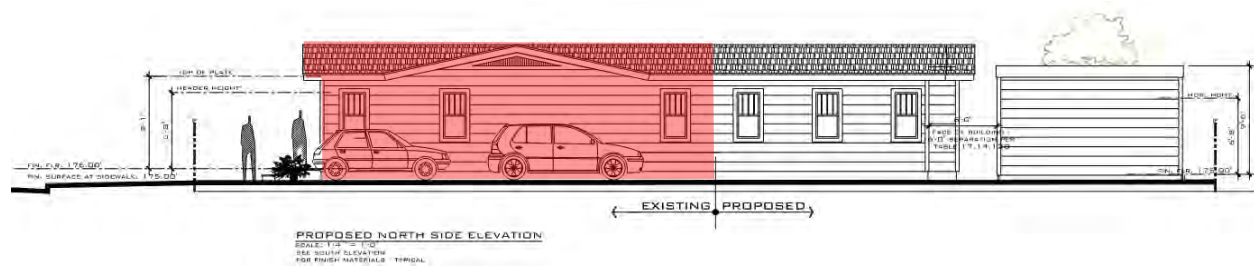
Proposed north elevation. The area of the existing residence is shaded red. Source: Architectural Design Solutions, "Regalado Remodel," Sheet A-6. November 19, 2024. Edited by Page & Turnbull.
